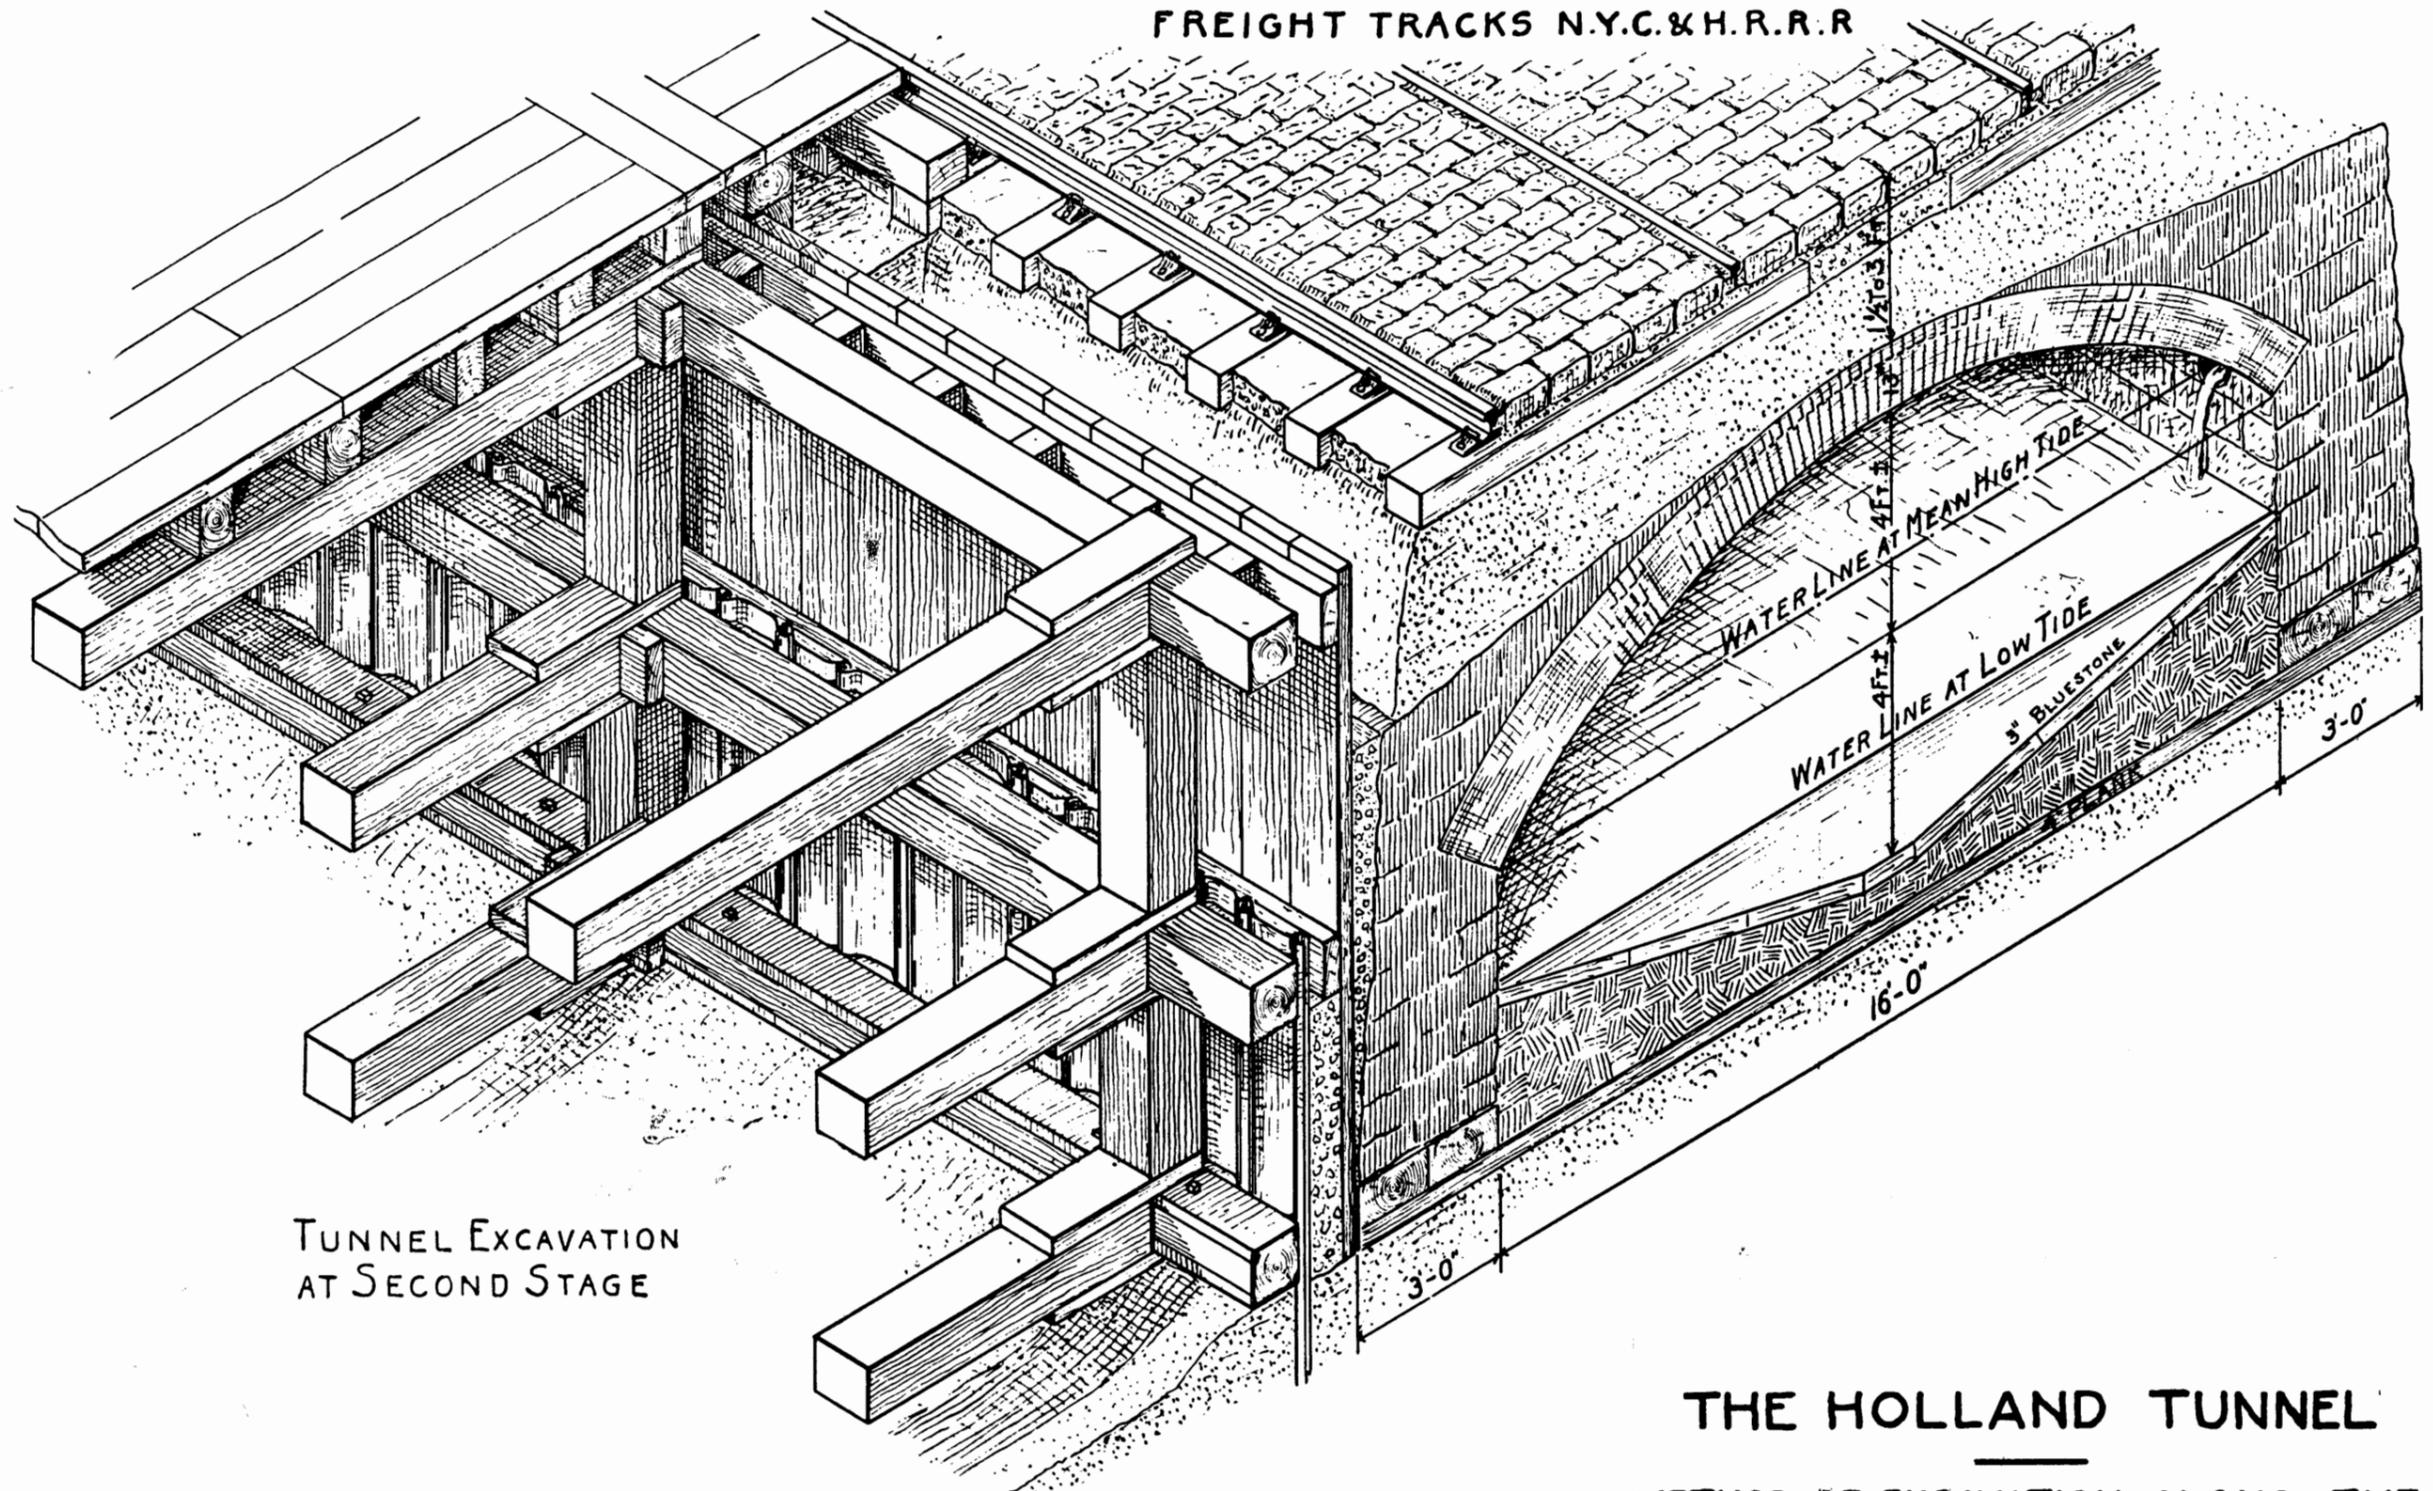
Partially Completed Tunnel Section, North Tunnel.
